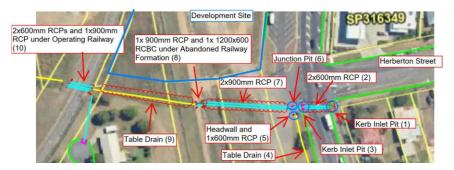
Drainage Infrastructure in the Vicinity of Byrnes Street/Herberton Street Intersection
